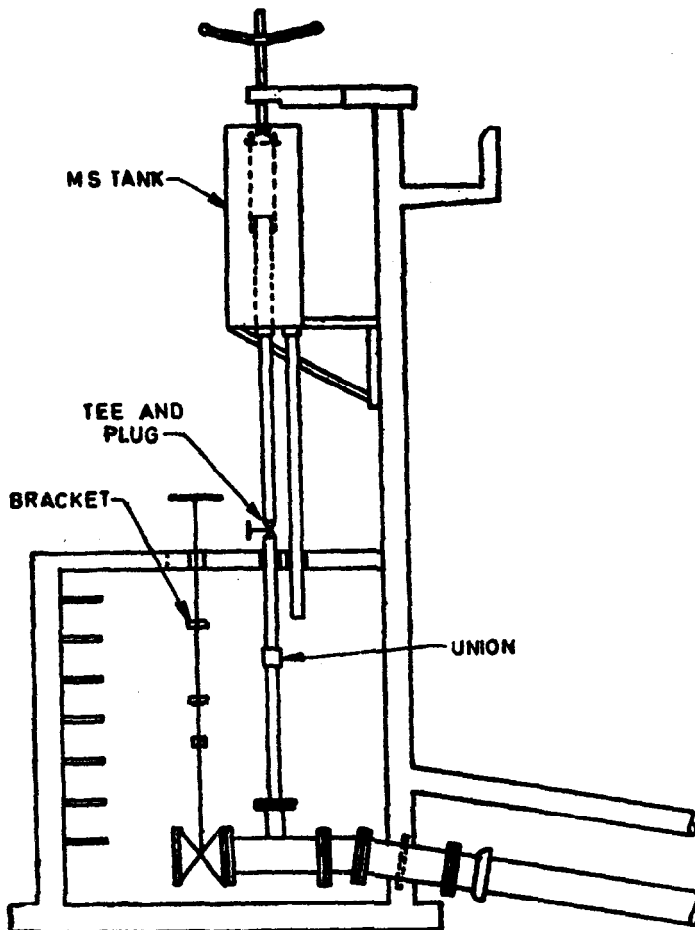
TYPICAL SKETCH OF CONSTANT BLEED TANK
